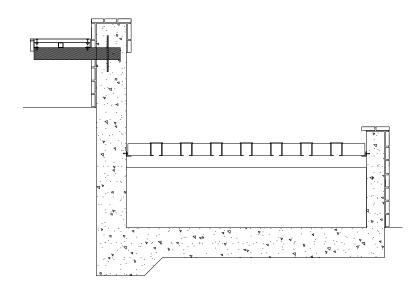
Construction detail of hydroponic bed with raft construction and incorporated seating. (Author, 2015)
